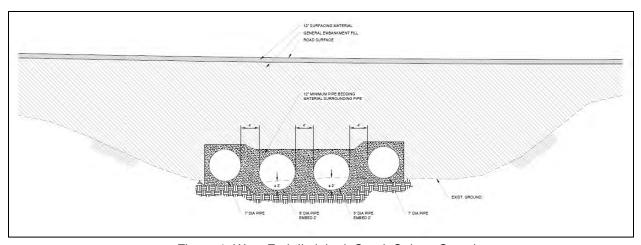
West Fork Ikalukrok Creek Culvert Crossing
